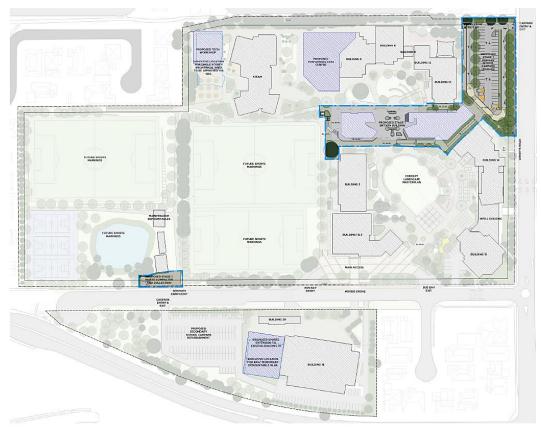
Stage 1 Works Site Plan (Source: PMDL)
